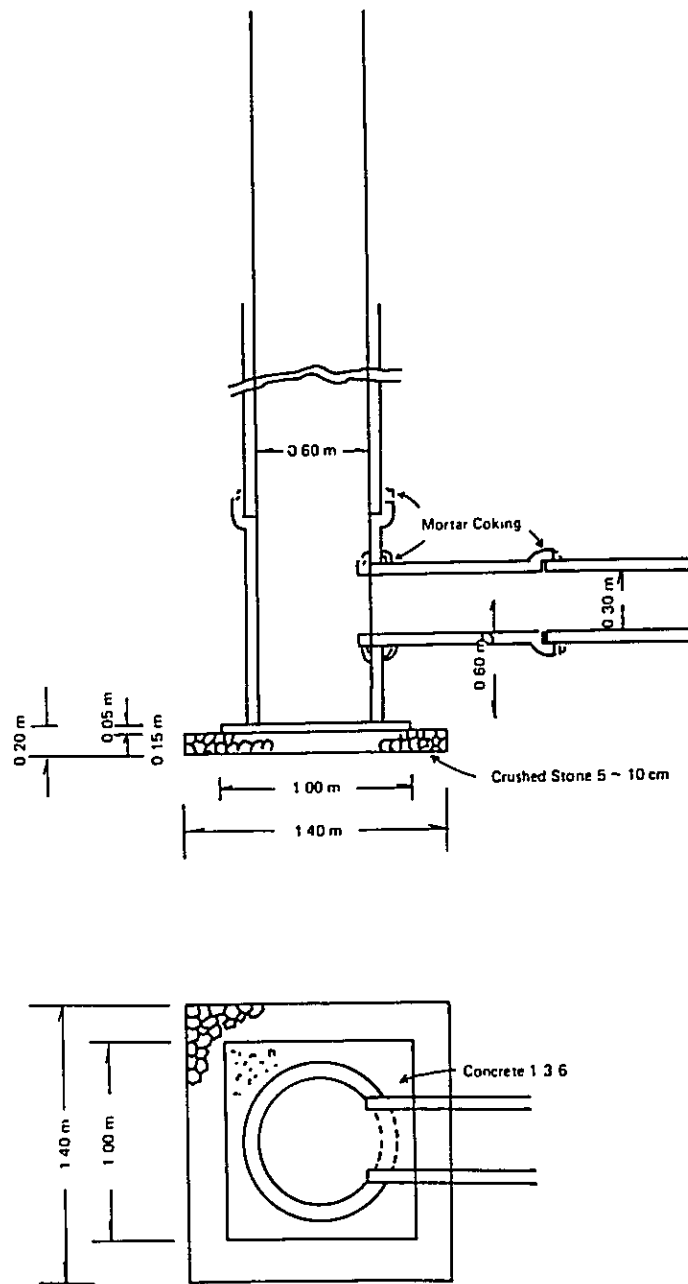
Detail Drawing of Pipe Work Footing
